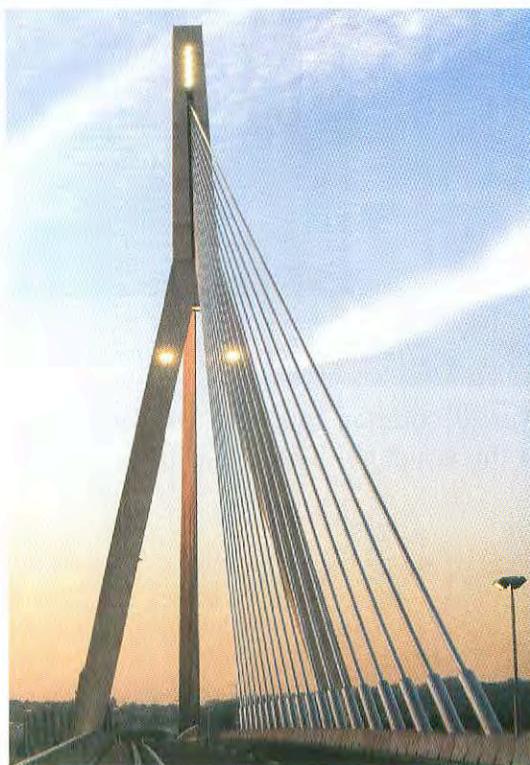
Wandre Bridge, pureness of details given by stainless steel cable ducts - Belgium [2]
